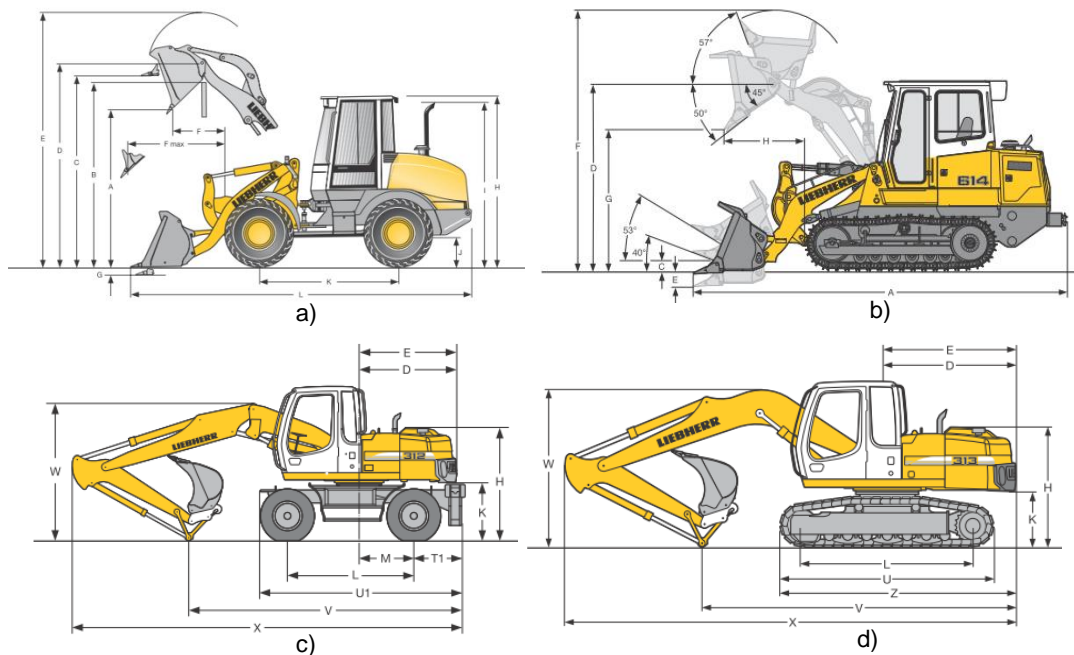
a) Wheeled loader, b) crawler loader, c) wheeled excavator and d) crawler excavator from Technical Specifications of Liebherr International Germany GmbH
